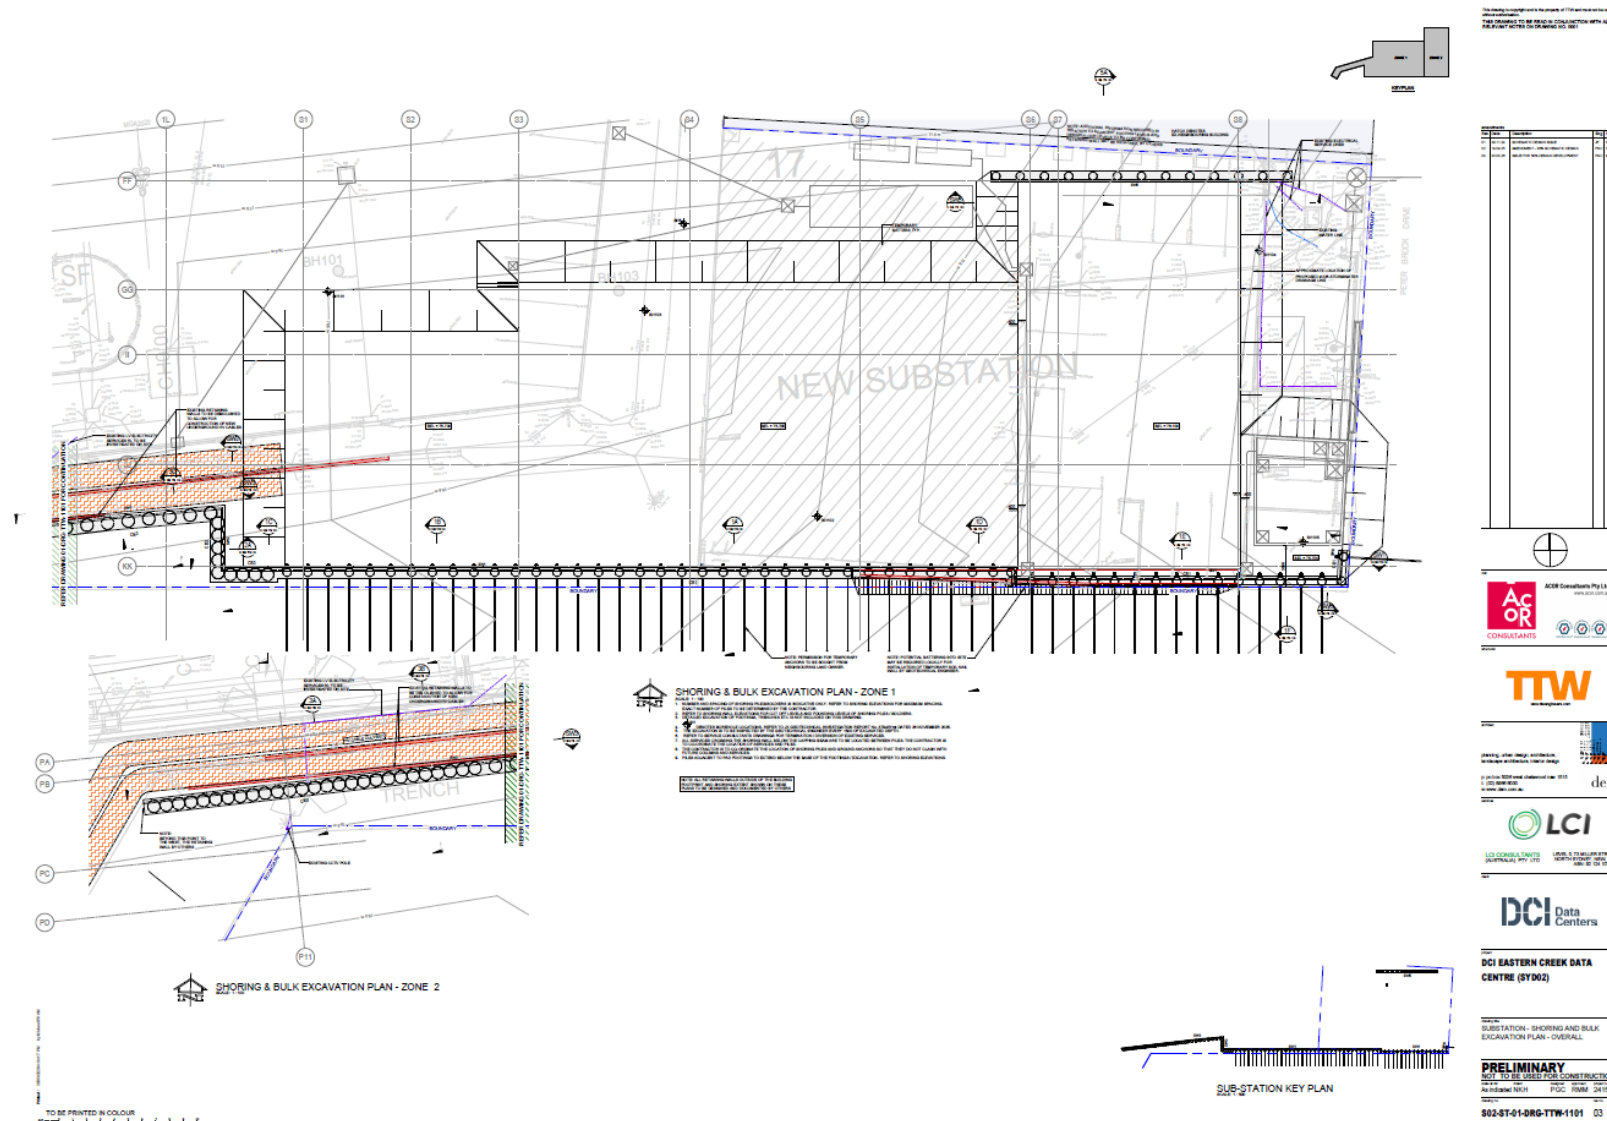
Preliminary plan showing location of shoring and bulk excavation inside the southern boundary (DEM/TTW 2026)
